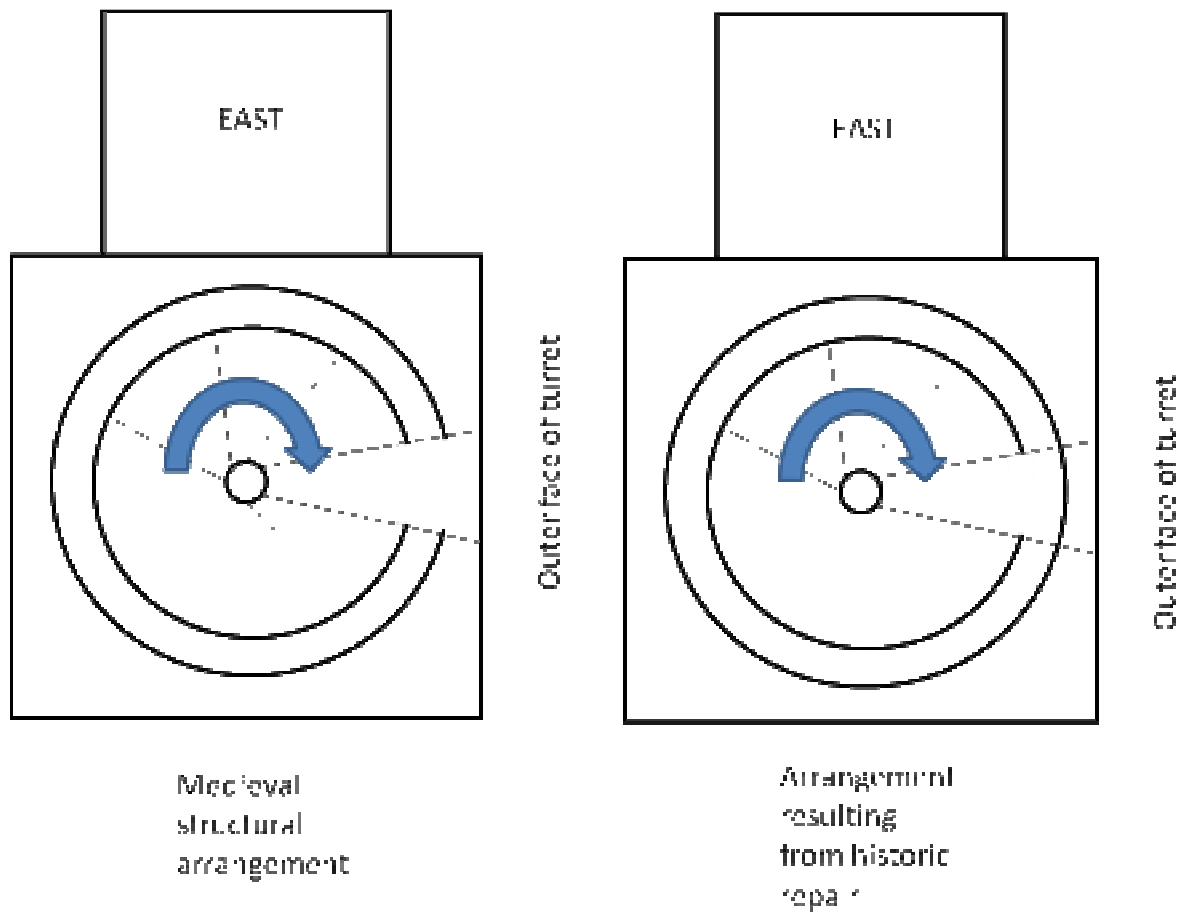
East Front, schematic plan through south buttress showing evolution of structural arrangement
